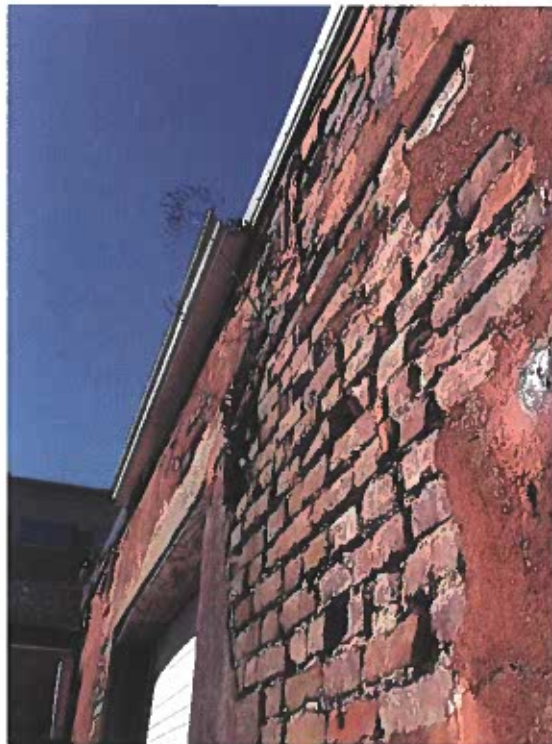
Water eroded the mortar directly below a beam and causing wall instability at the support.
